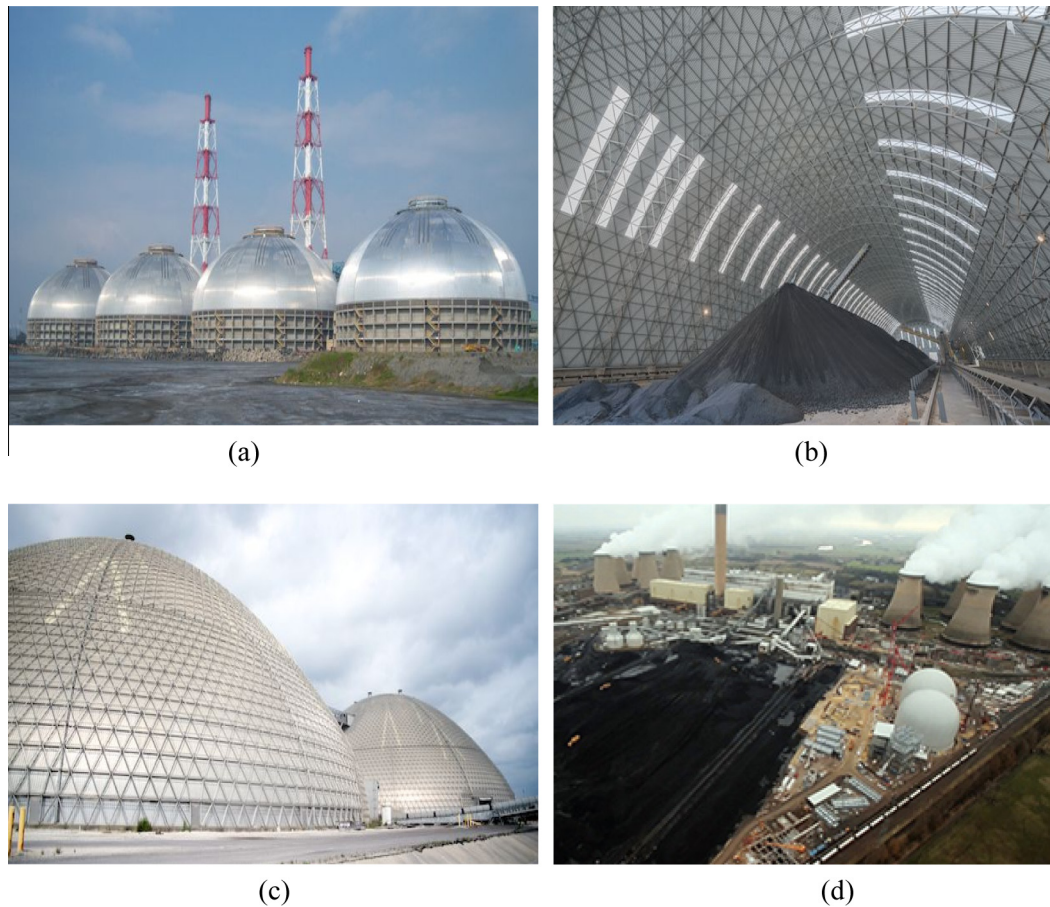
Coal storage domes (a) 180,000 t coal storage dome for power plants, Taiwan, (b) 60 m × 200 m longitudinal coal storage, Tunisia [16], (c) 122 m diameter storage dome with internal cladding, Florida, USA [16], and (d) coal pile feeding Drax Power Plant, England [17].
